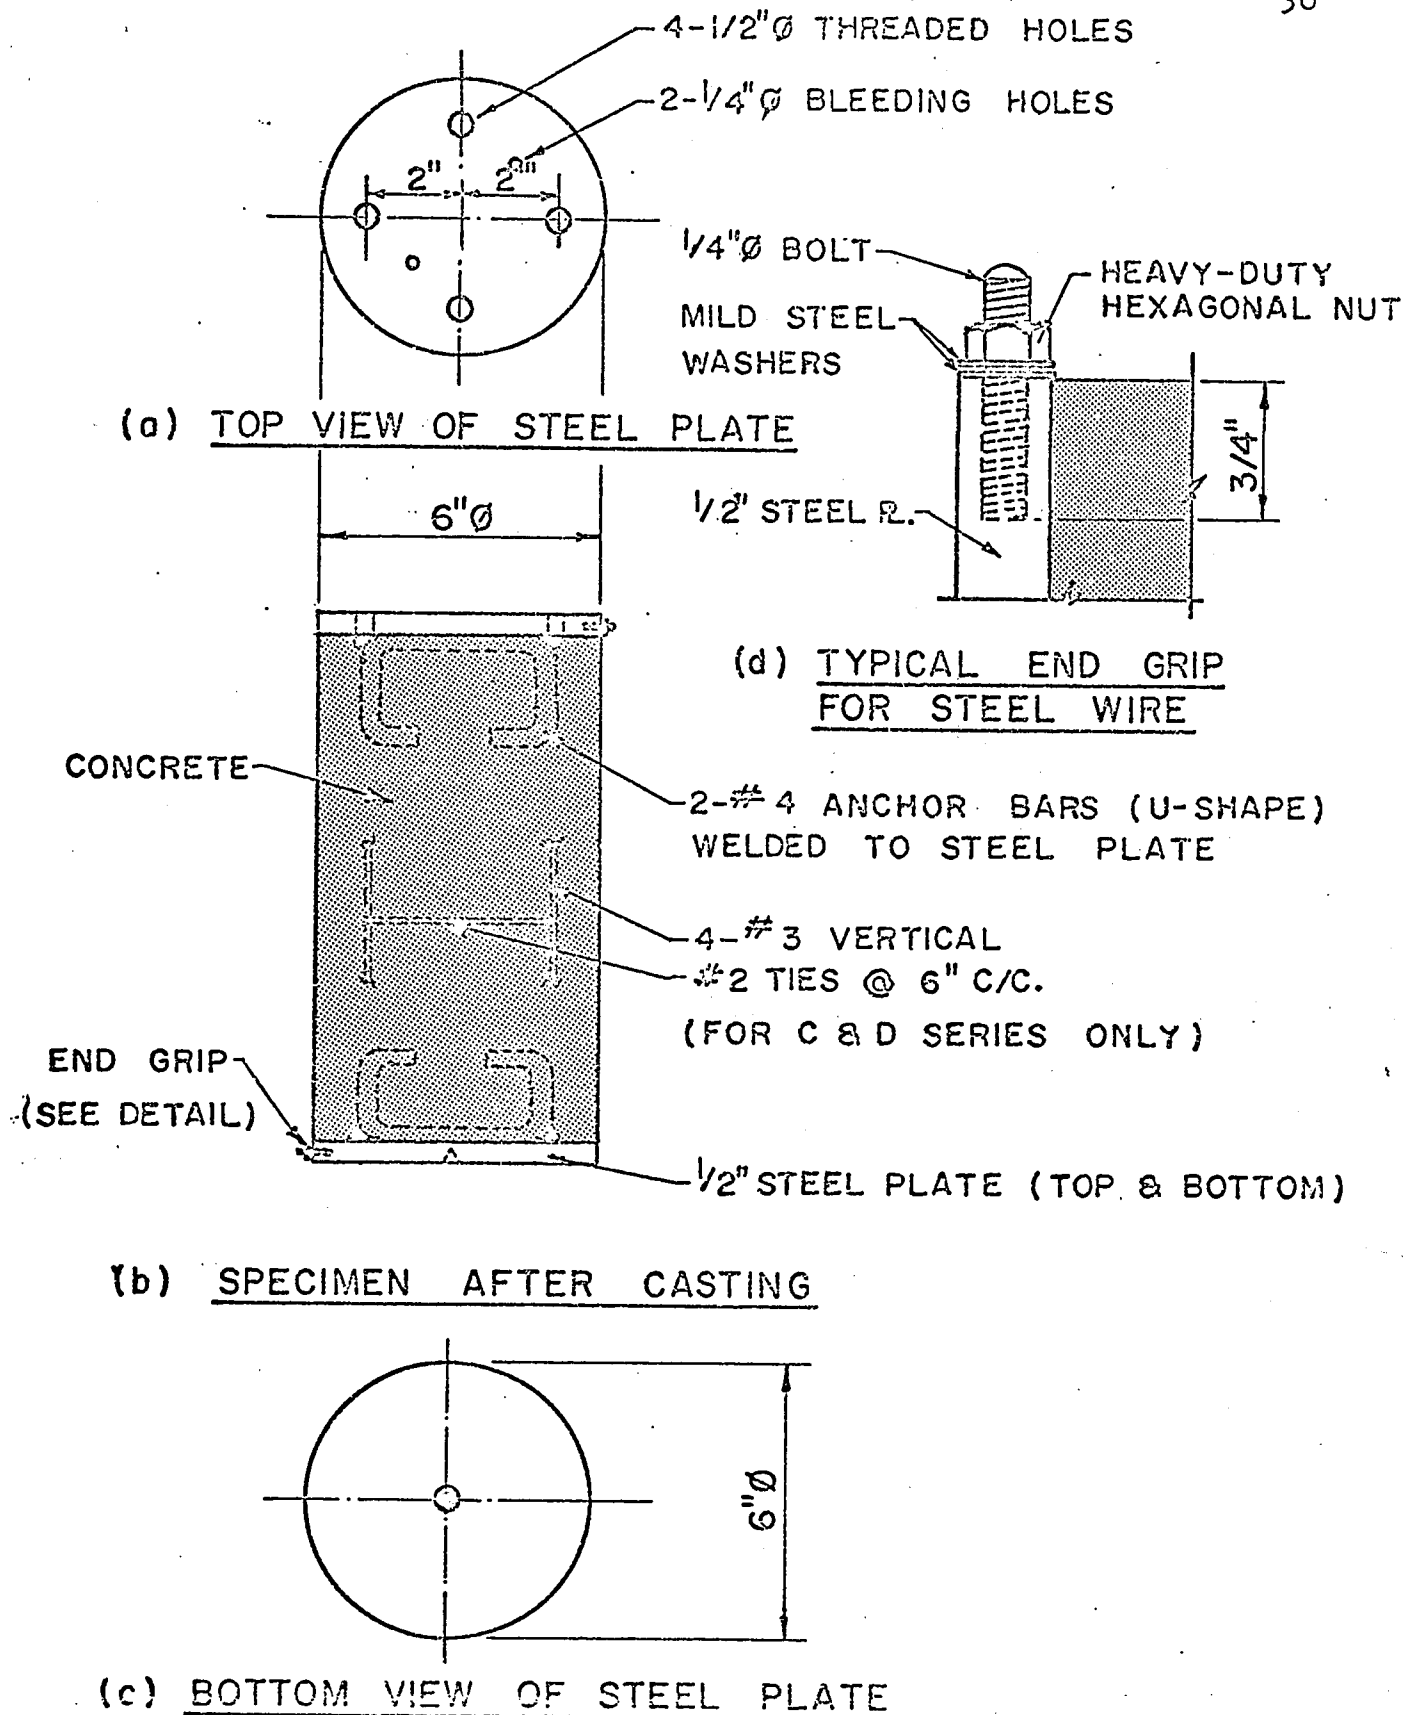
FABRICATION DETAILS OF SPECIMEN
